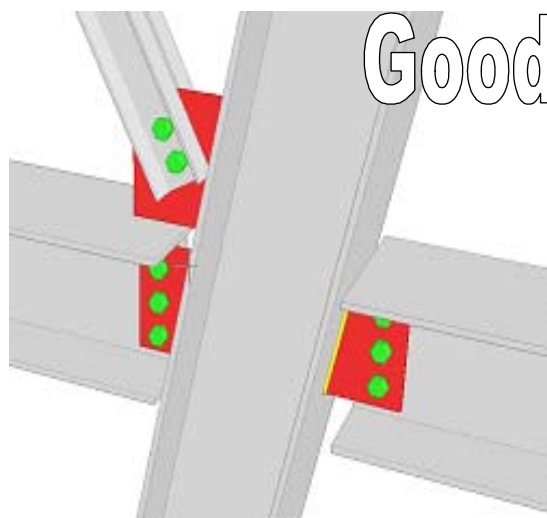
Simple beam to column joint of open hot rolled sections with diagonal bracing, successful case with fin plates, column HE180B; beam HE180B; bolts 3xM20
